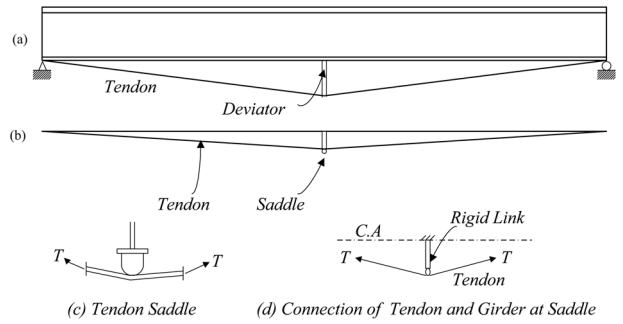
Drape point of tendon girders with prestressed steel I beam model
